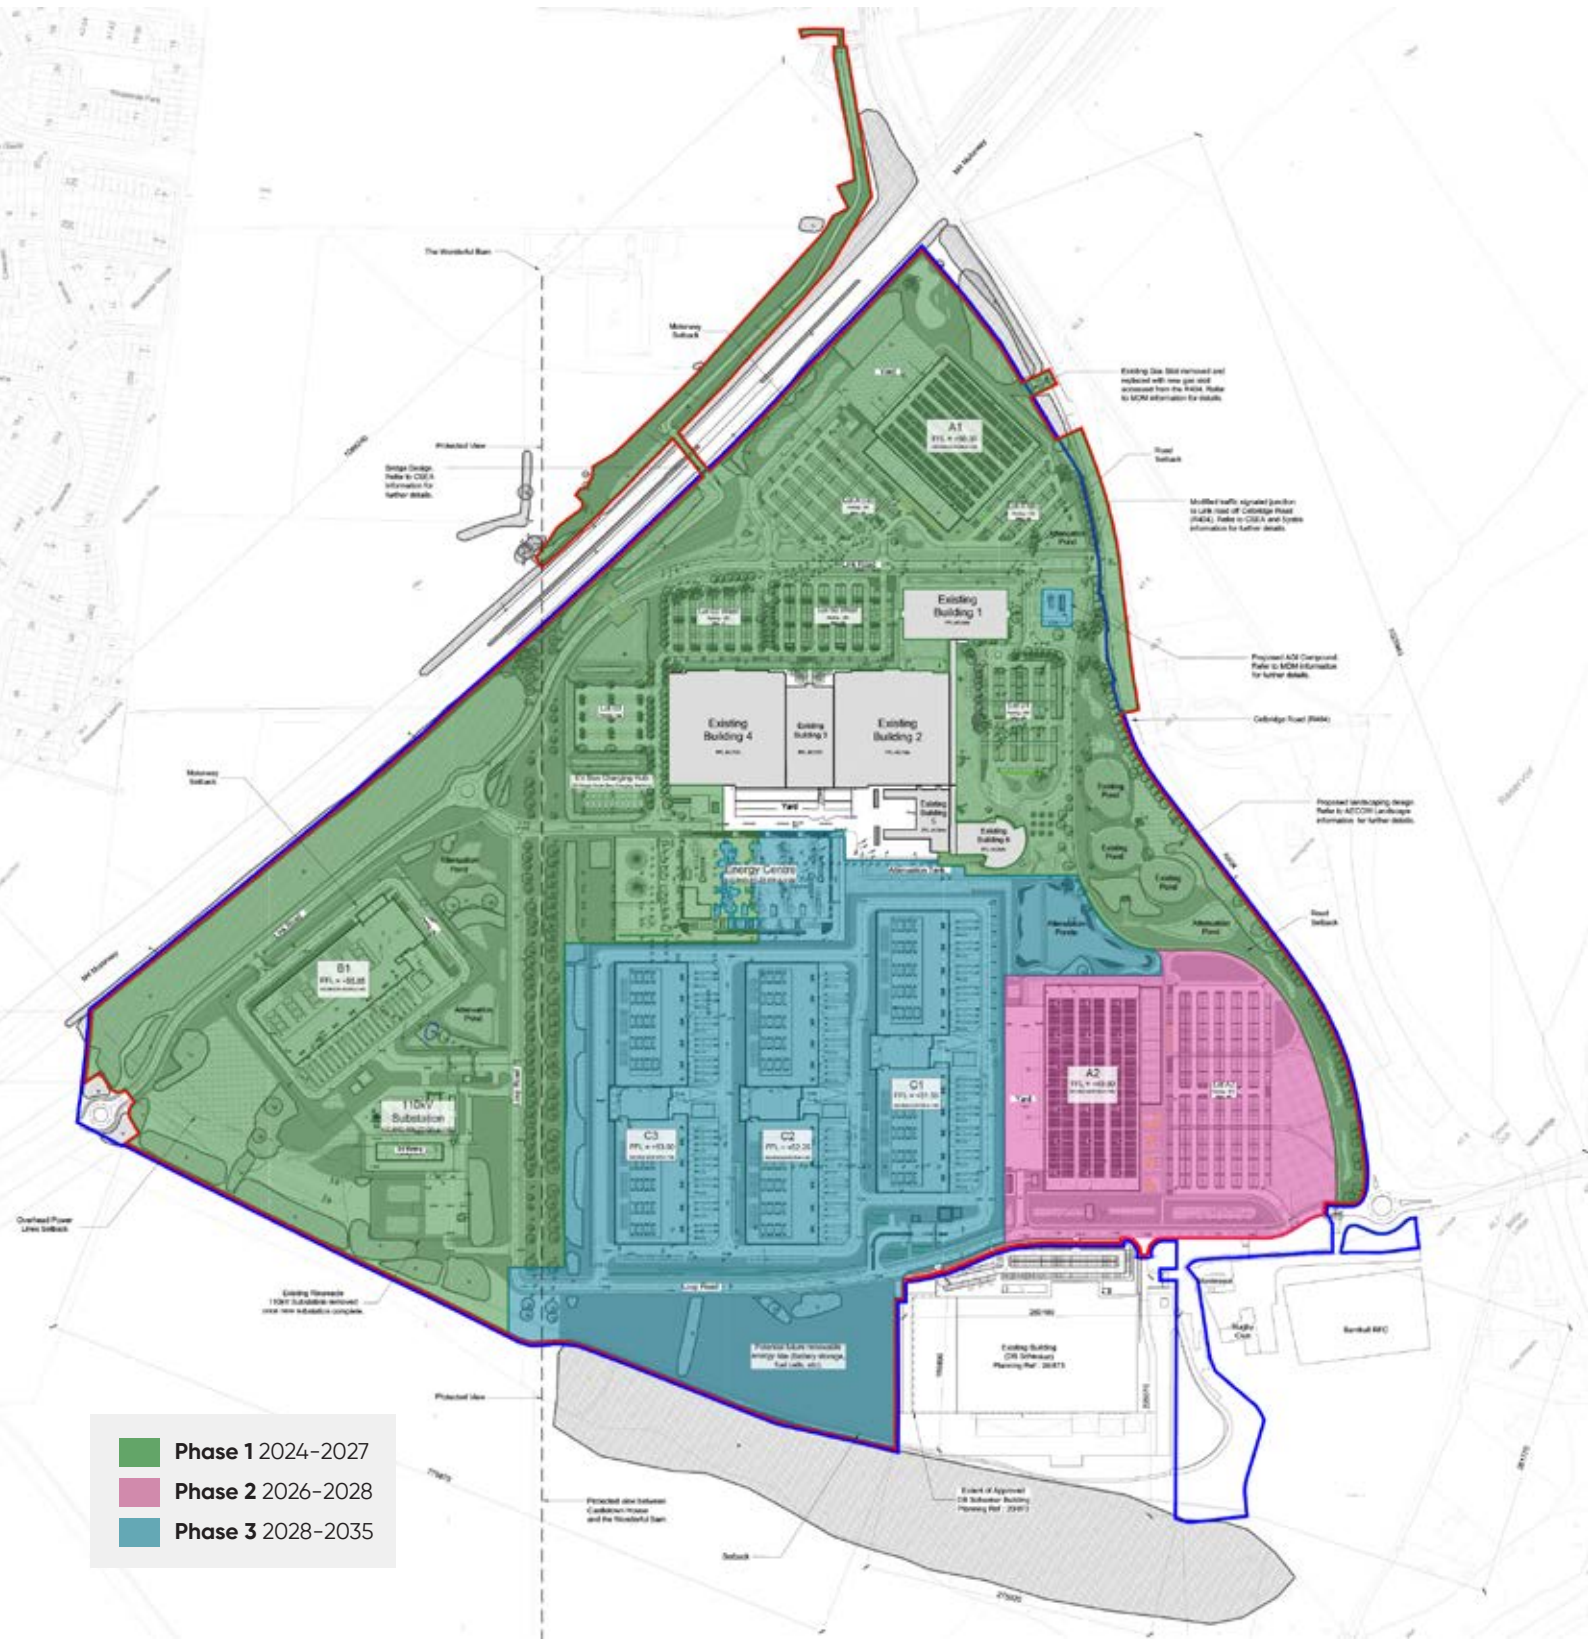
Kildare Innovation Campus Phasing Plan. Source: RKD Architectural Design Statement and Drawing A-1041.
